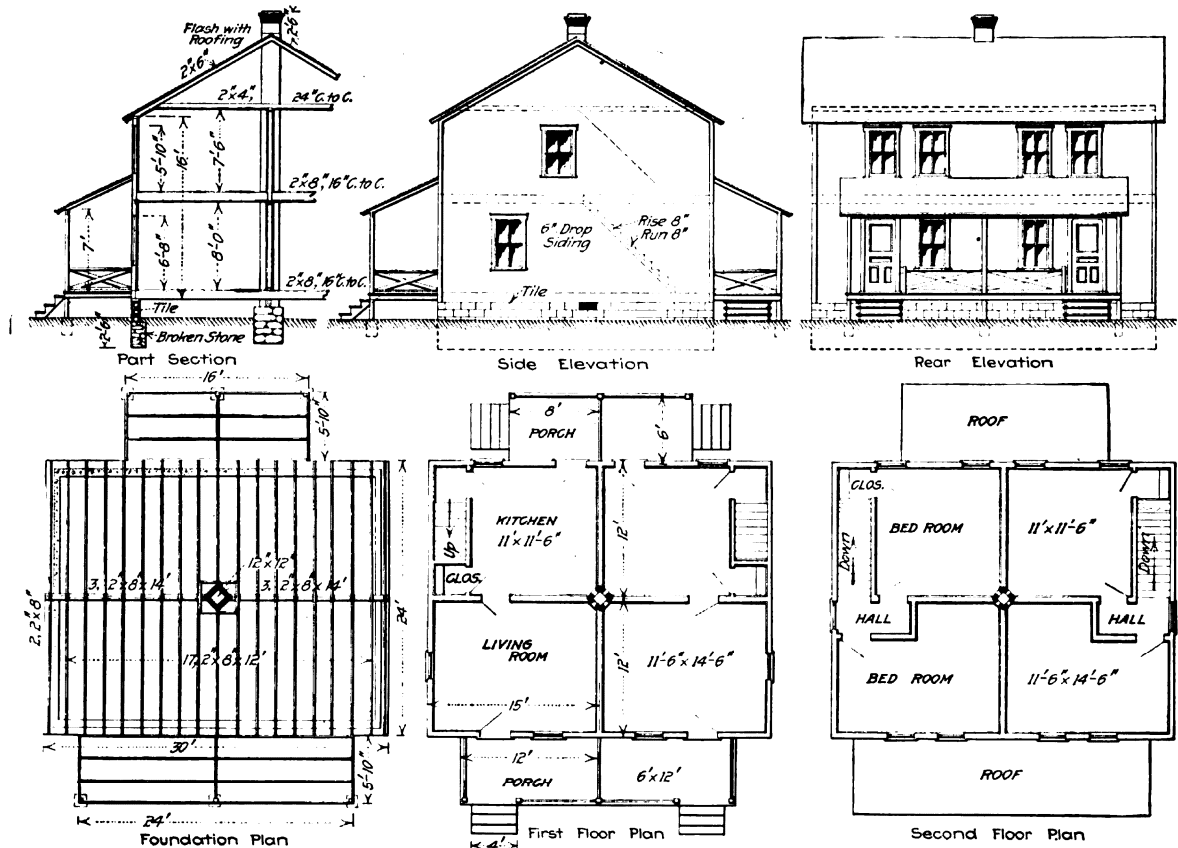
DETAILED DRAWING OF DOUBLE HOUSES BUILT AT COAL RUN, PENN.
